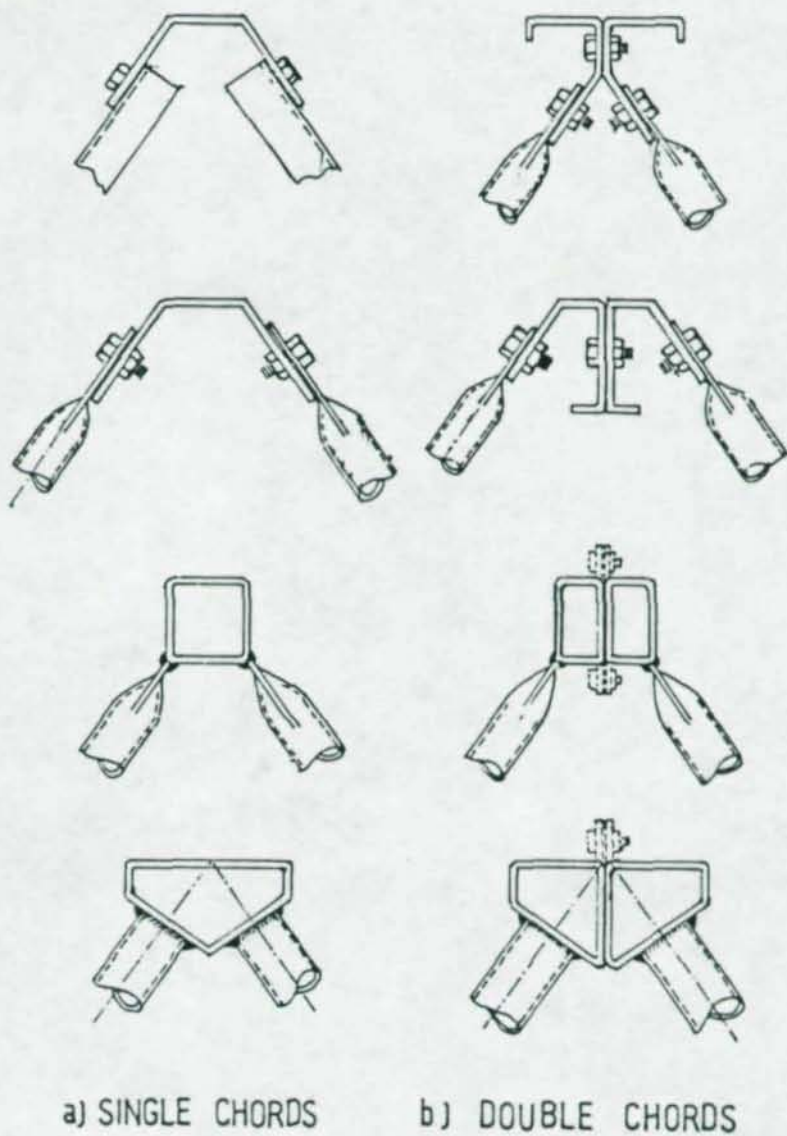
Cold-Formed Steel Chords For Folded Truss Systems (Dannemann 1984)
